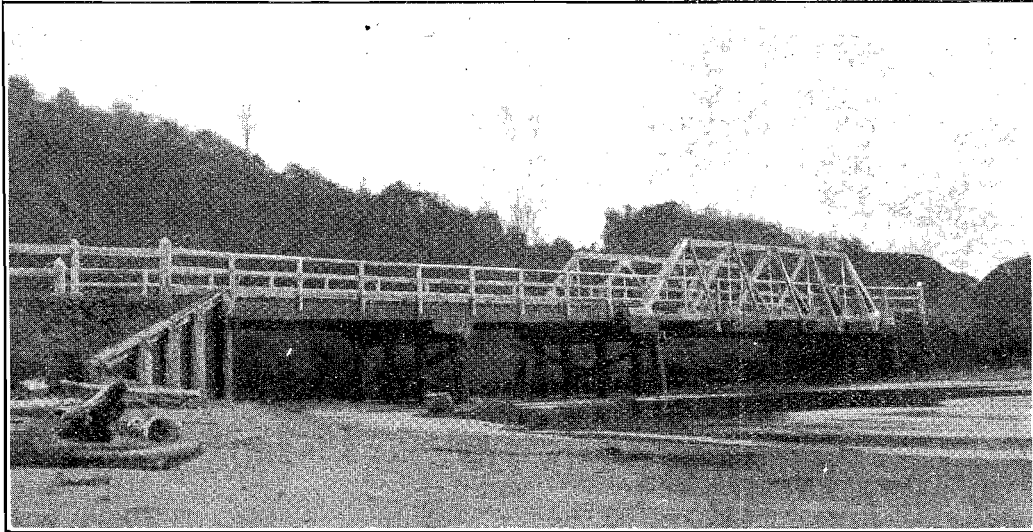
Bridge over Kennet River, Apollo Bay—Wye River Road.
